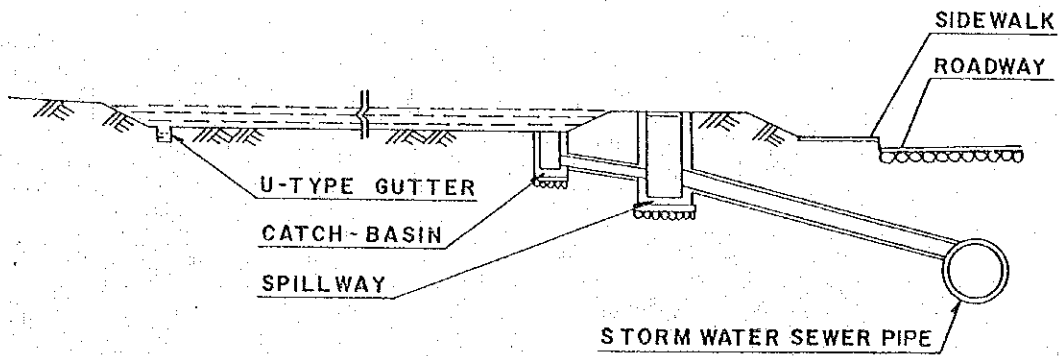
STANDARD DRAWING OF DRAINAGE FACILITIES
